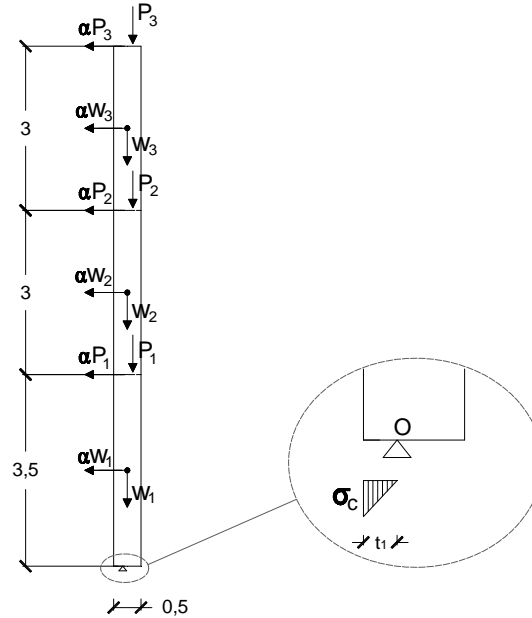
Kinematic mechanism concerning the out-of-plane overturn of the façade wall.
